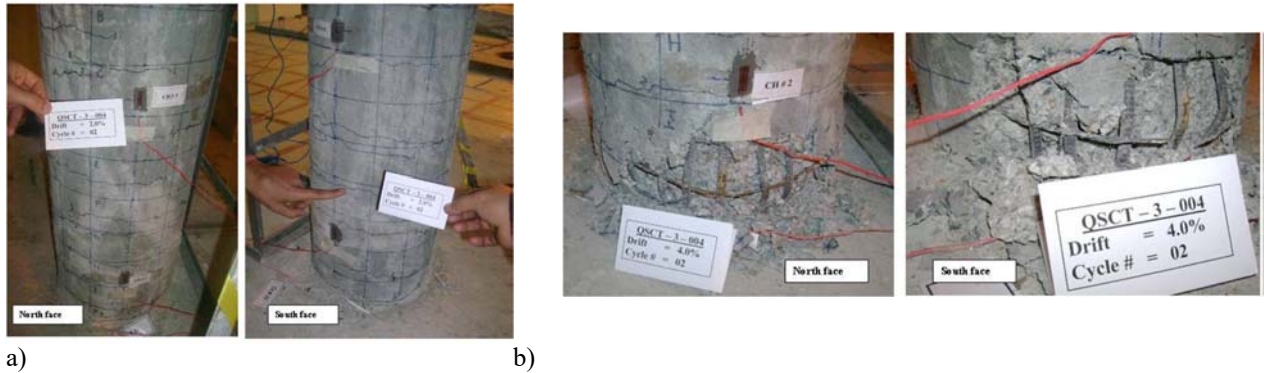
Failures observed in the experimental test a) Tensile cracking, b) Compressive crushing of concrete and rebar yielding
